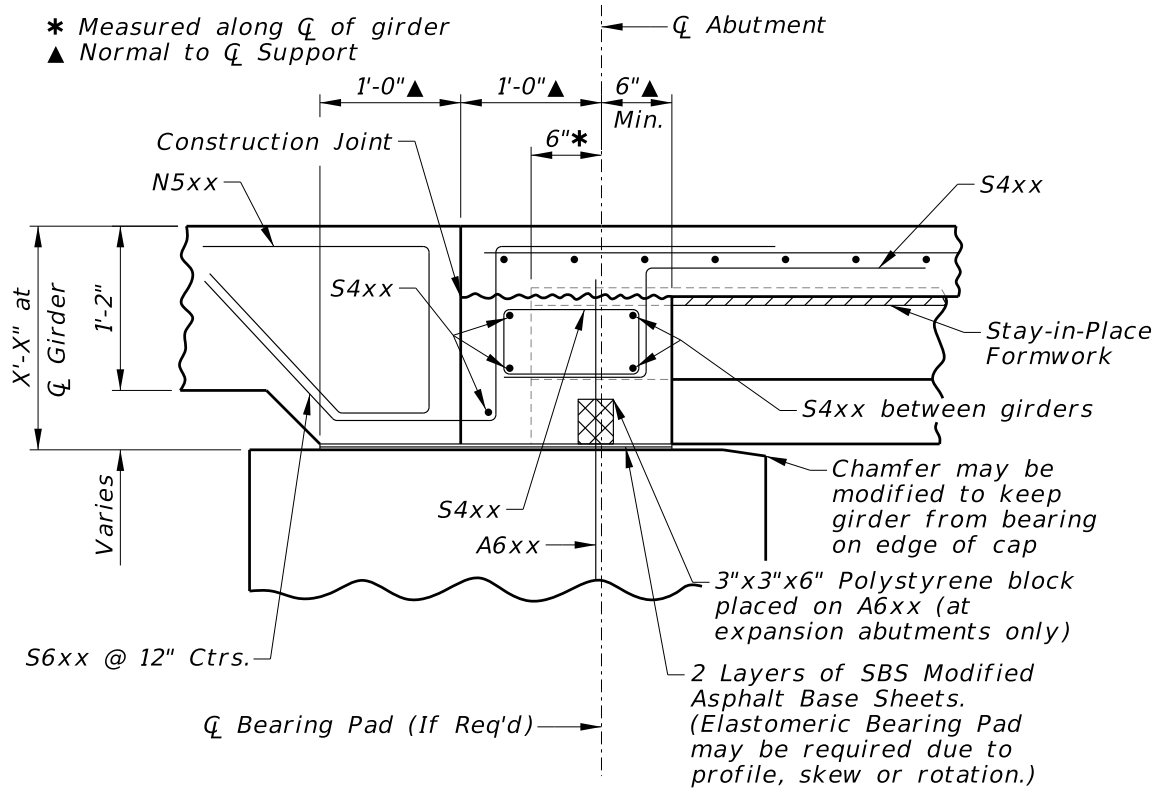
IT Girder Slab Turndown (Required on IT 300, Optional on IT 400)
